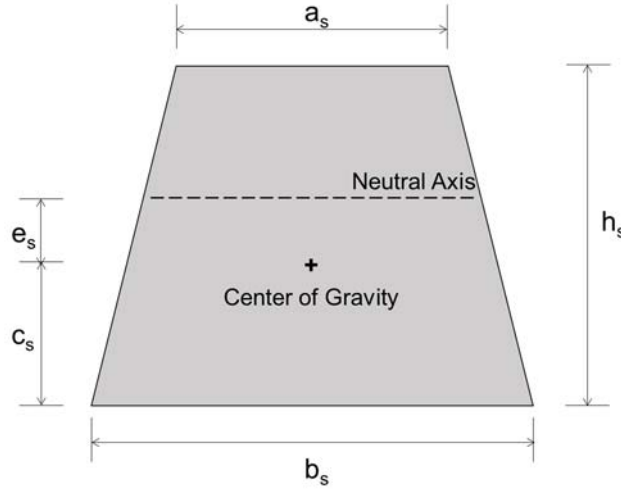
Schematic showing example concrete crossie cross-sectional view and location of critical sectional elements.
